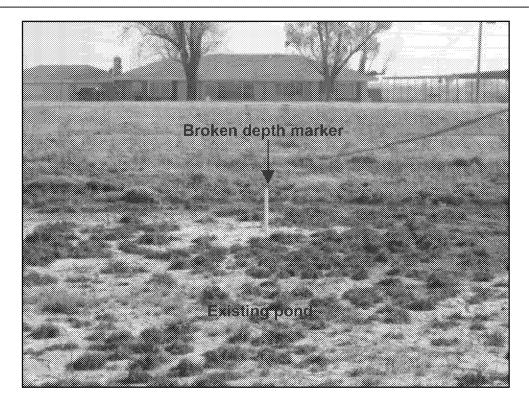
View facing north from the north side of the existing pond in the southwest corner of the Facility at the pasture located between the existing pond and the catch basins.
